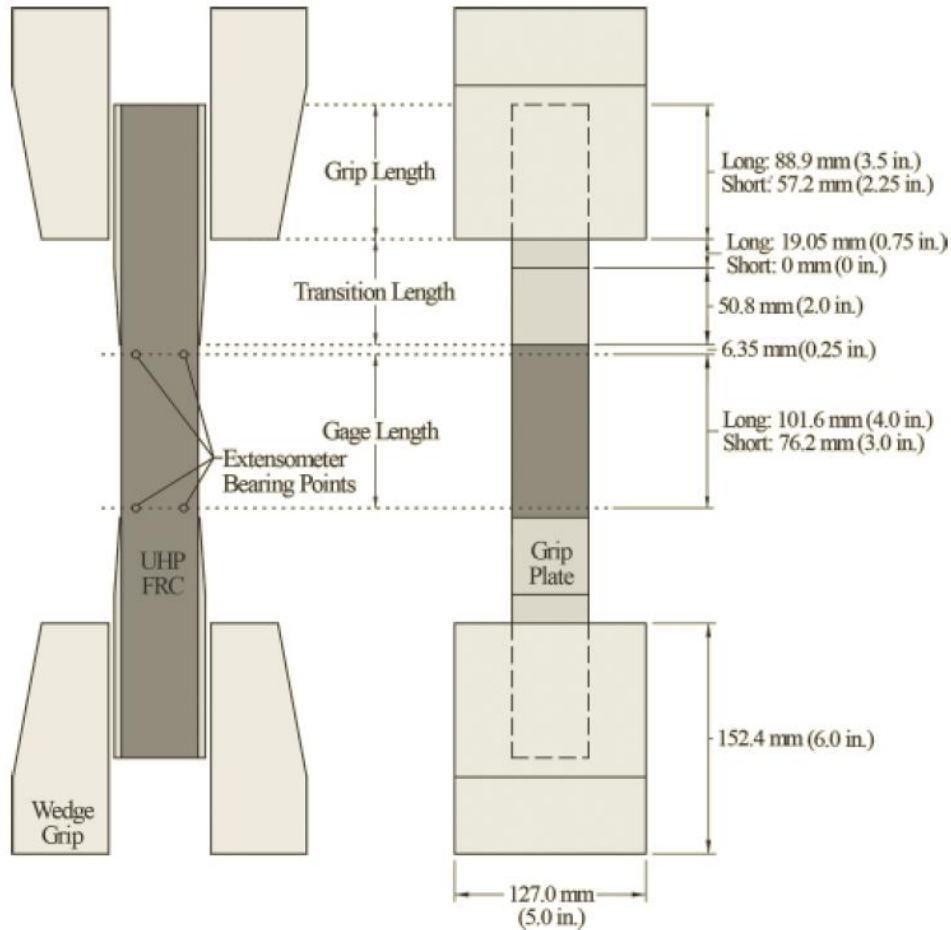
Sample direct tensile test specimen dimensions and gripping method (Graybeal and Baby, 2013)
